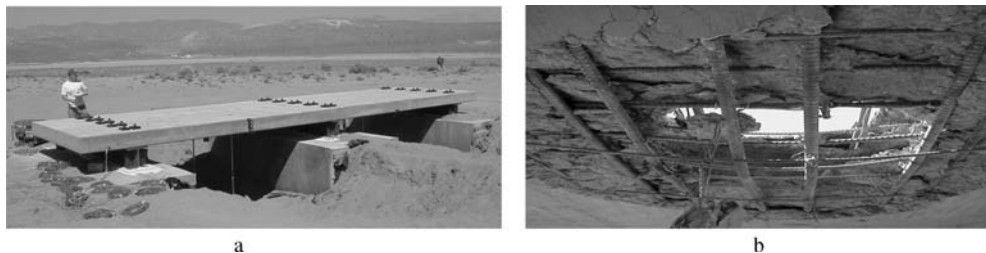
Concrete bridge deck prior to the tests. Figure 1b. Underside of the concrete bridge deck after the test with the 50 pound charge. The damage crater is about 48 inches across.
